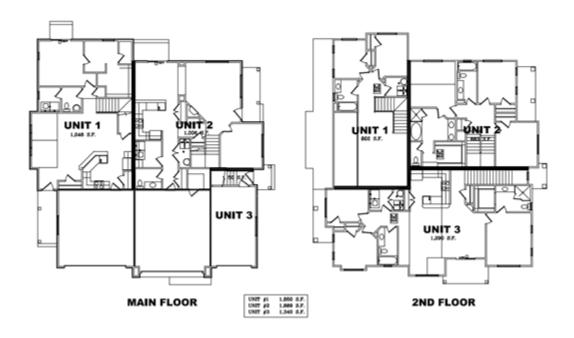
Proposed 3-plex Floor Plan, Courtesy of Fritzi Realty
